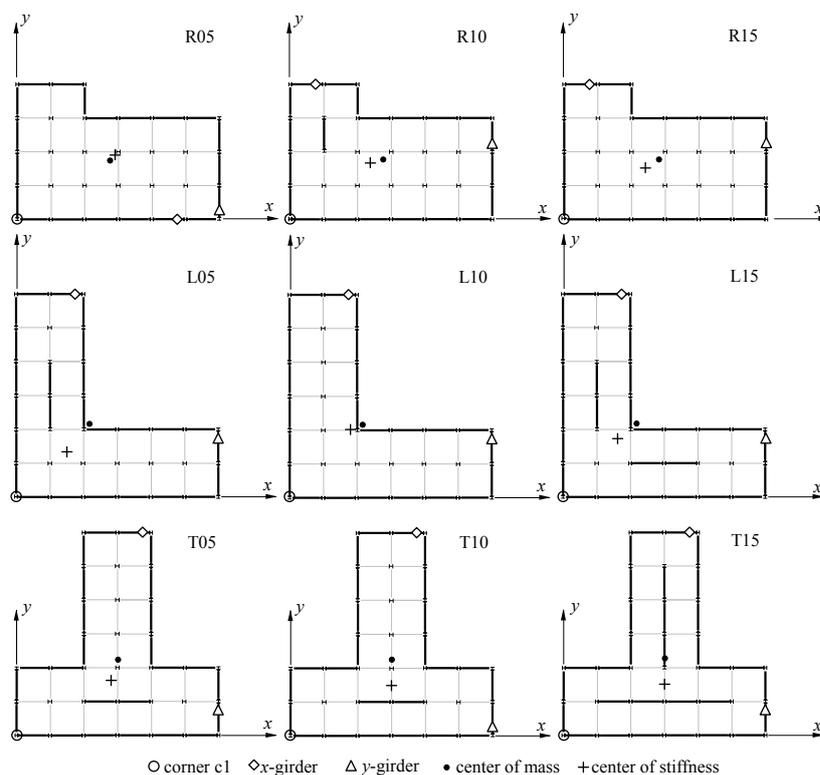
Plan views of the nine multi-story asymmetric-plan buildings.
